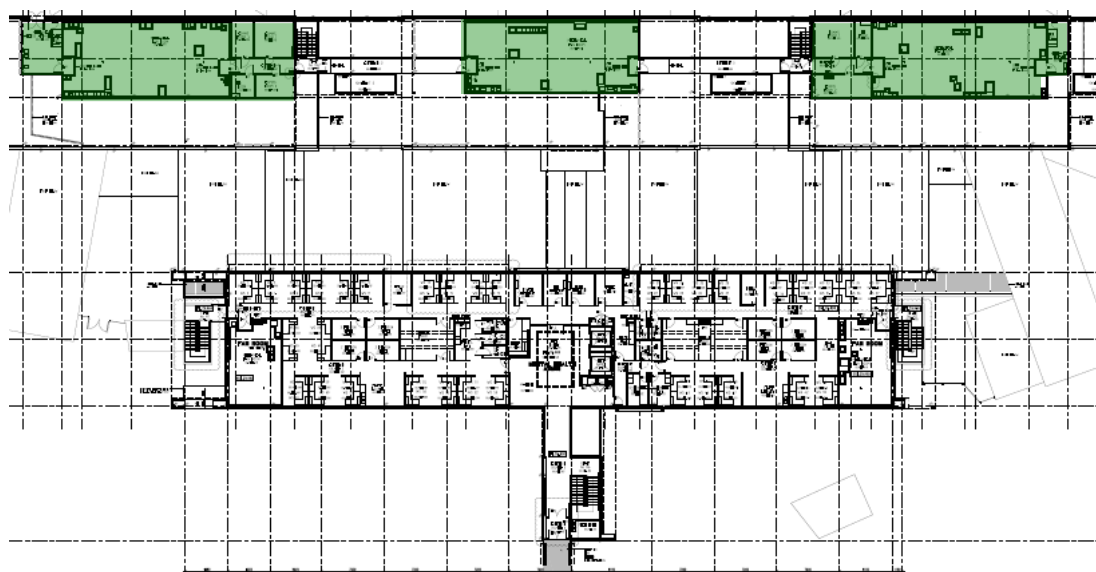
MEH L00 floor plan showing extent of floor slab covered in this alternative solution
